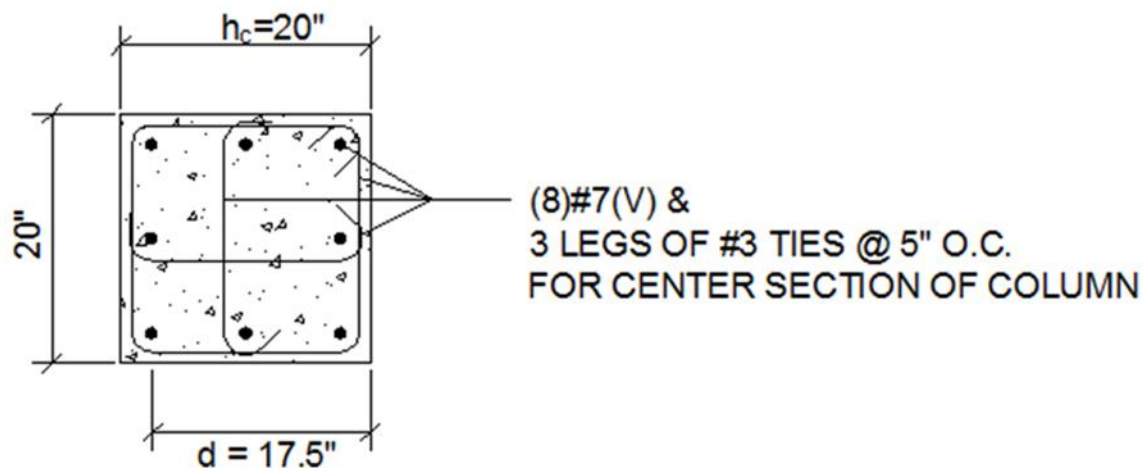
Interior column, cross-section at center of column at all floor levels based on SDC D design.
